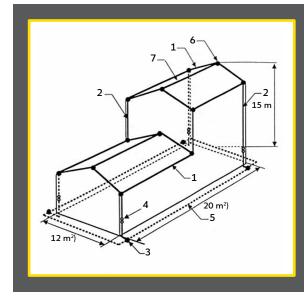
Fitting the external lightning installation on a building made of insulation material, in case of different roof levels:
